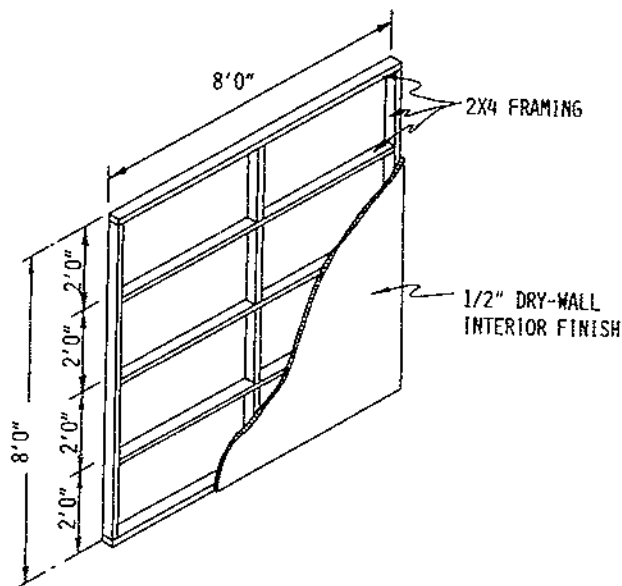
Framed wall panel with horizontal 2 by 4's spaced 2 feet on center.
